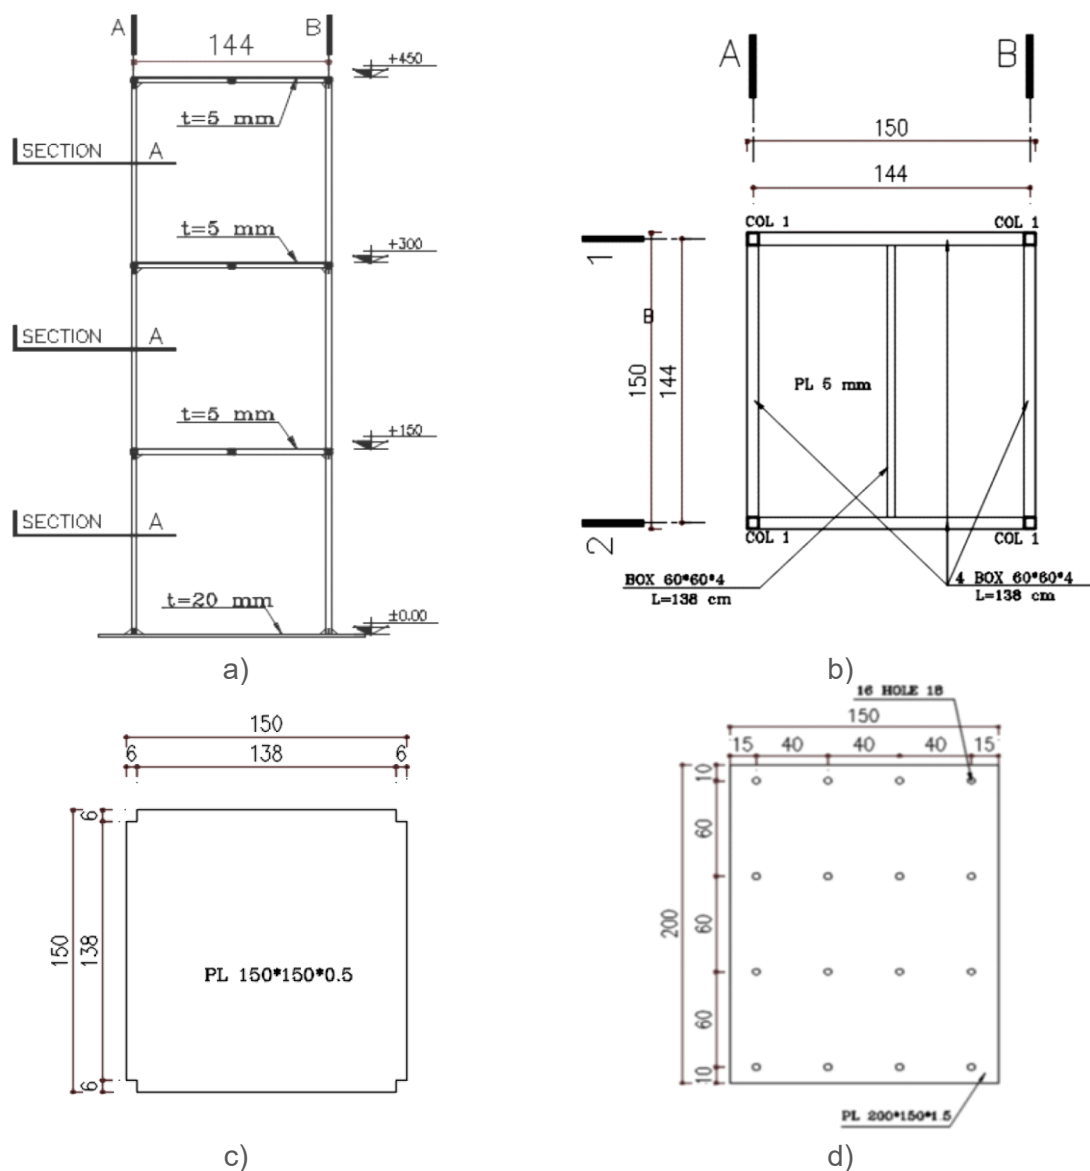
Geometric details of a three-story experimental frame model: (a) elevation, (b) plan, (c) floor plate, and (d) base plate
